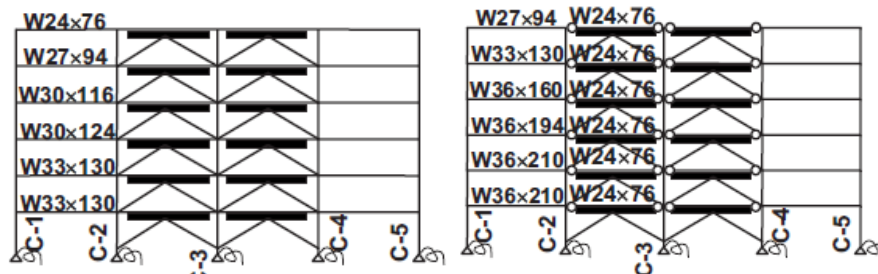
Steel Frames with Elastomeric Dampers – Rigid and Pinned Interior Columns (Lee et al. 2009)
